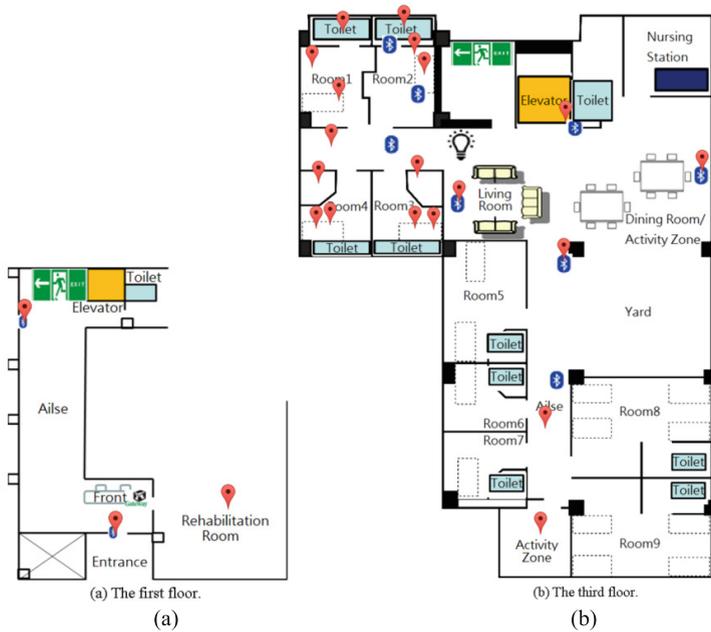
Sensor deployment in (a) the first floor, and (b) the third floor in the caring facility (Color figure online)
